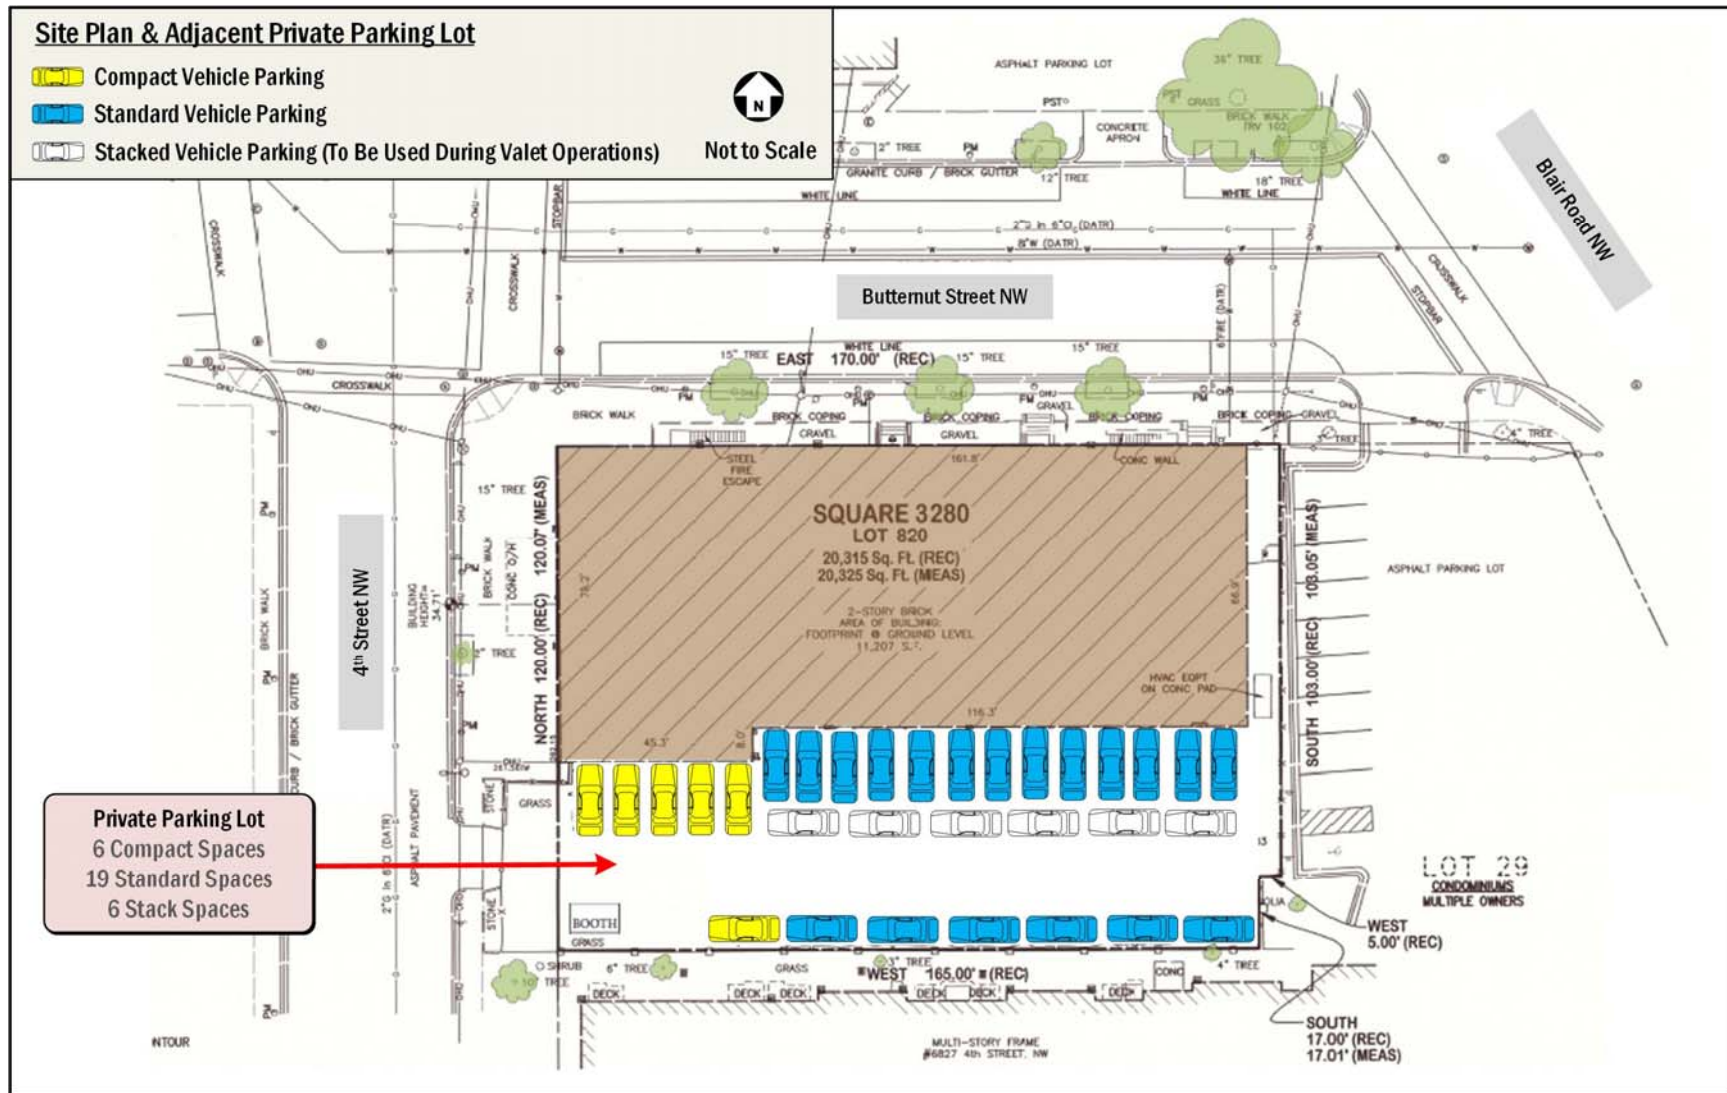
Site Plan and Adjacent Private Parking Lot, if Required
